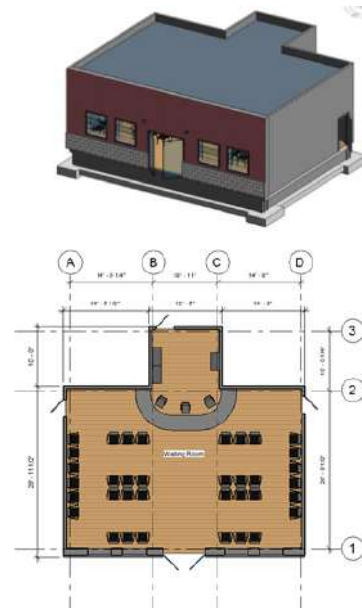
Top: merged BIM model; bottom: first floor architectural plan
